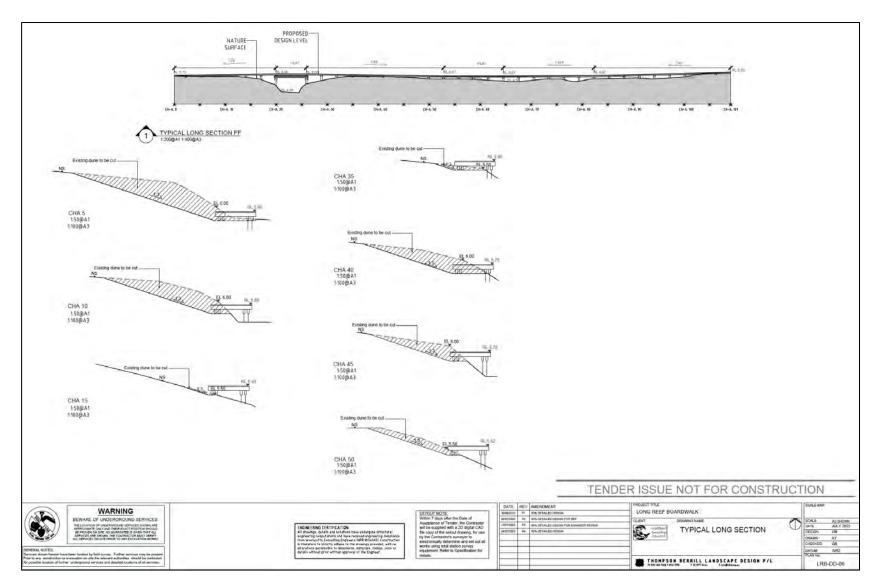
Preliminary draft of proposed cross section of excavation within the sand dune. (Source: Thompson Berrill Landscape Design July 2023 Plan No. LRB-DD-06).
